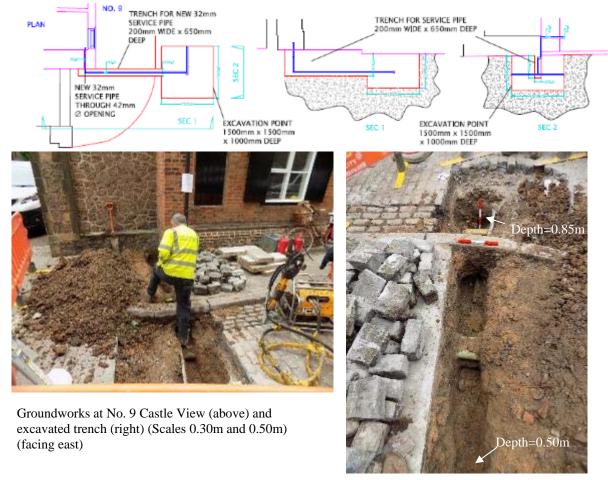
External connections at No. 9 Castle View and results of monitoring of groundworks.
